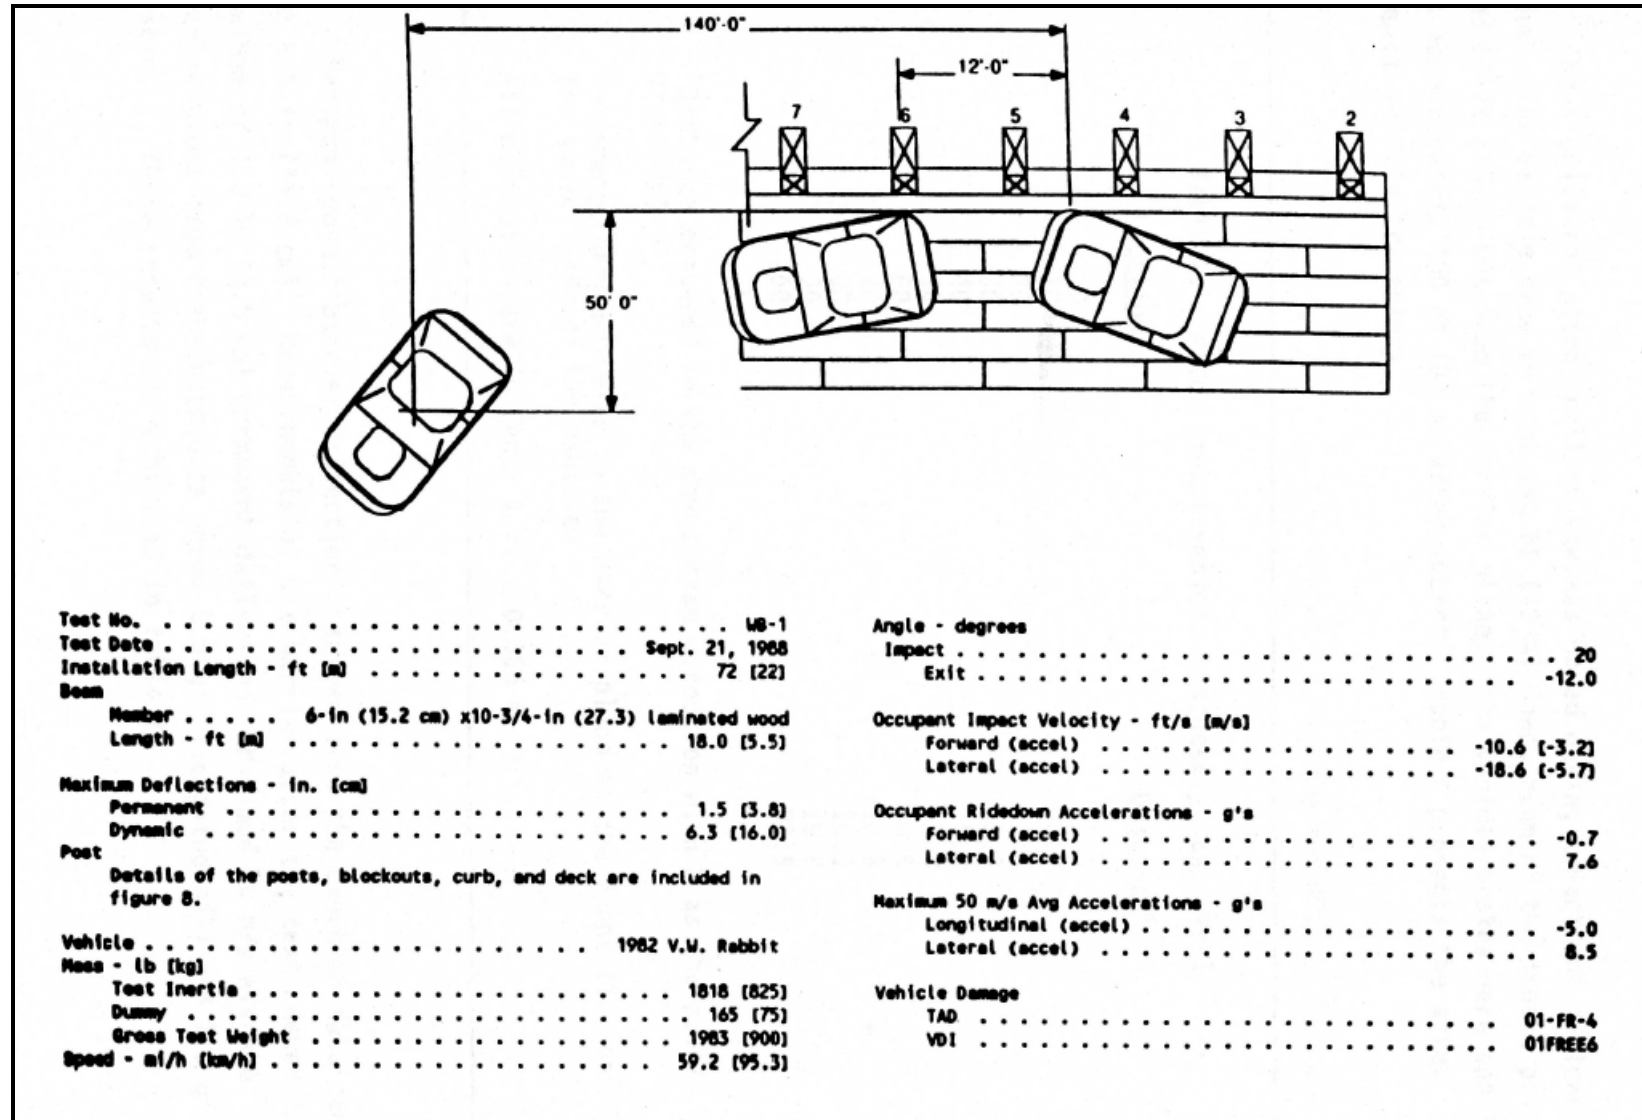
Forrest Service Glulam Bridge Rail Test 1
